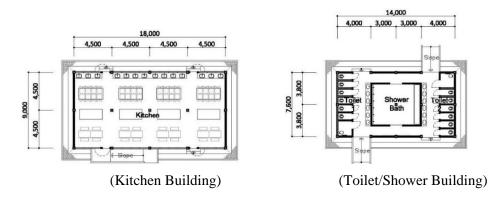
Students' Dormitory Ancillary Buildings Floor Plan (PKS TTC)
